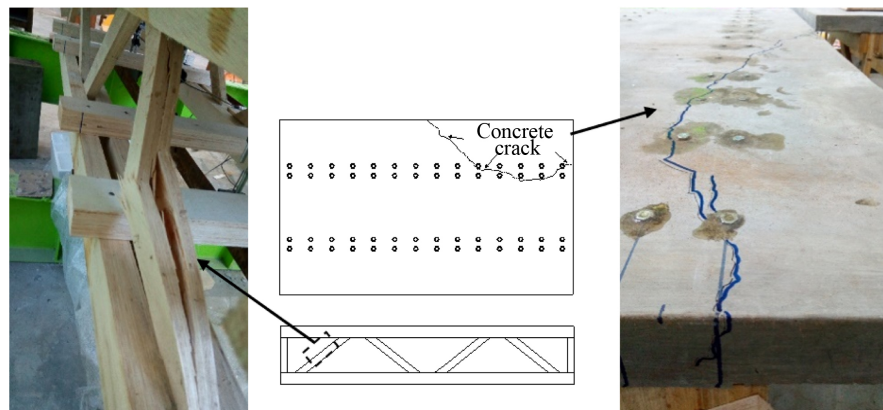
Failure mode of the prefabricated composite floor (PCF) specimen.
